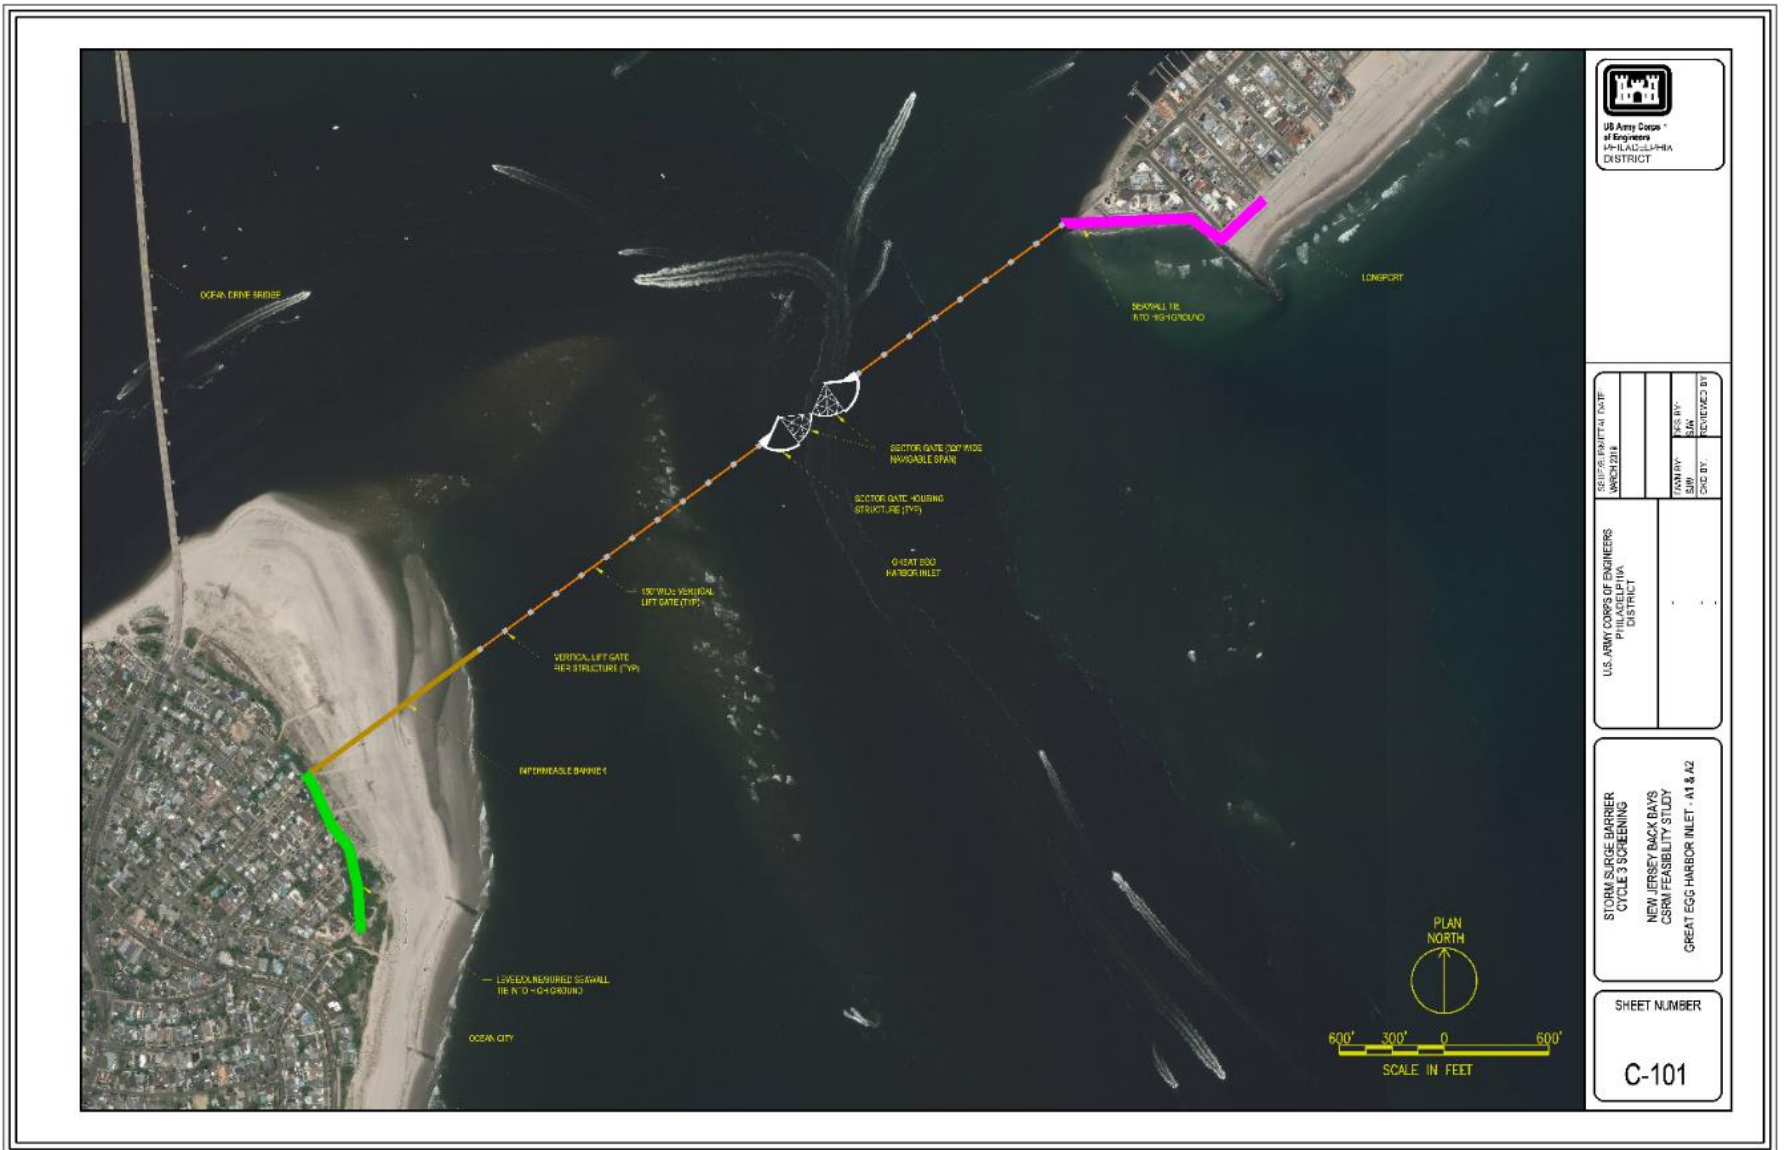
Great Egg Harbor Inlet SSB Plan View Layout
